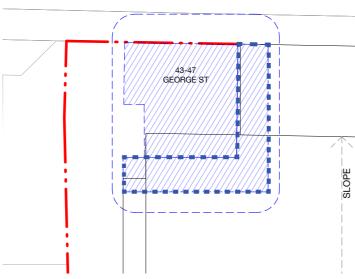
Envelope Plan with heritage interface zone outlined in Blue.
